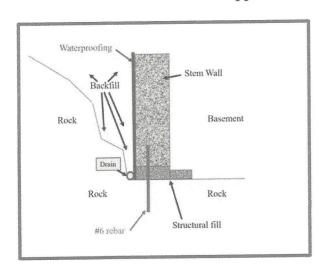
Schematic of the Surface Facilities Connection to Bedrock (where applicable).
